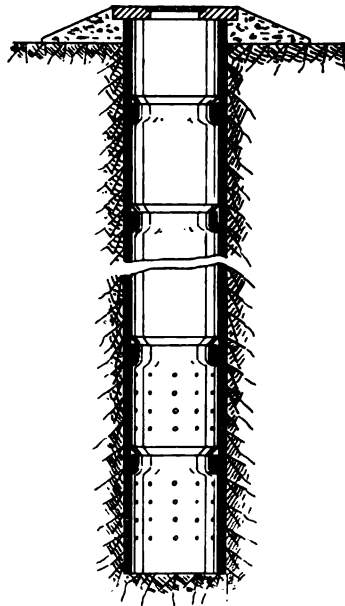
Shallow Well formed of Stoneware Tubes.
